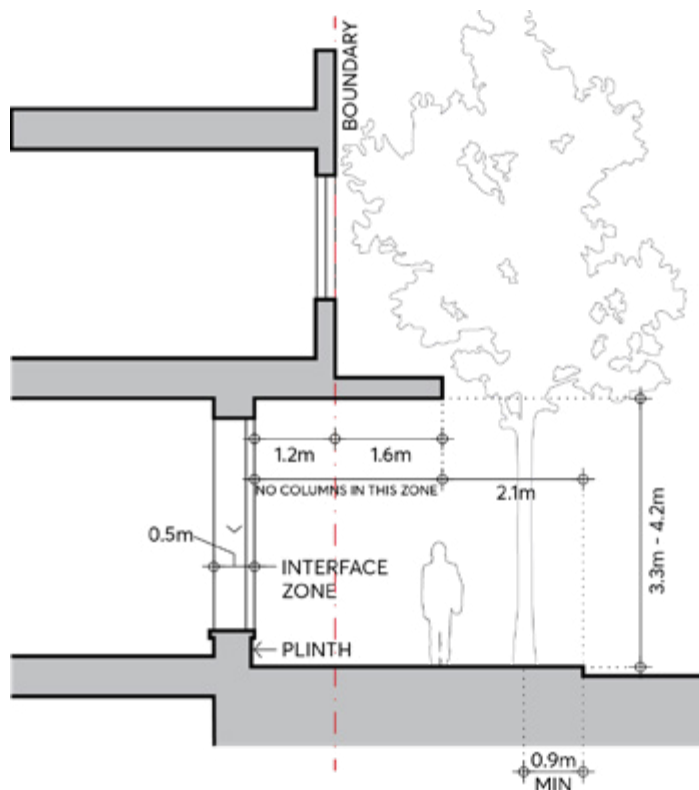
Street Section Aird St, O'Connell St and Campbell St
